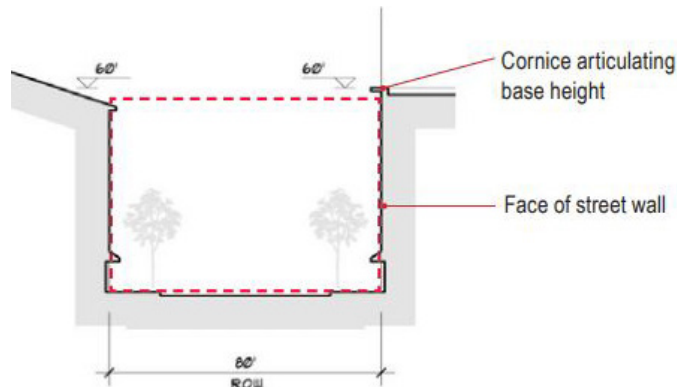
Street section with 3:4 proportions, with cornice articulation defining building base height.
